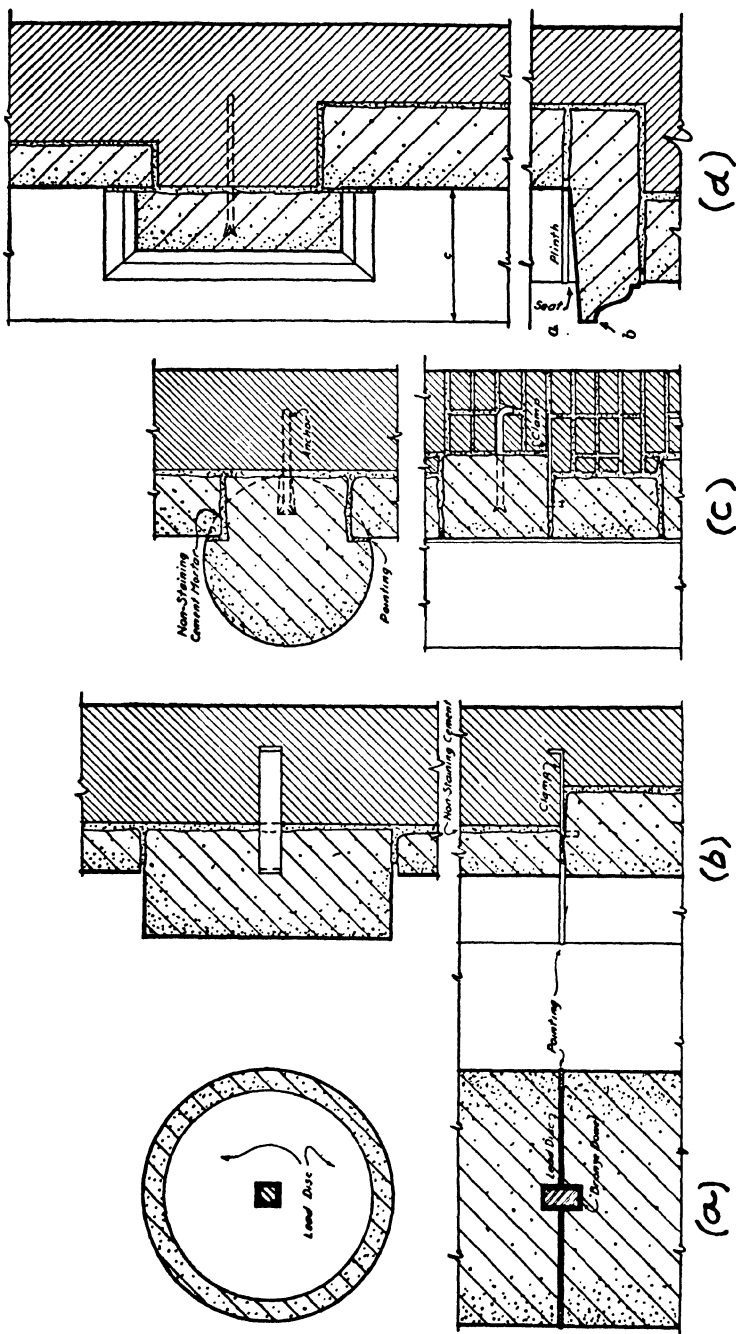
Stone Columns and Pilasters. (a) free-standing circular columns; (b) pilaster; (c) engaged circular column; (d) pilaster bearing on belt course.
